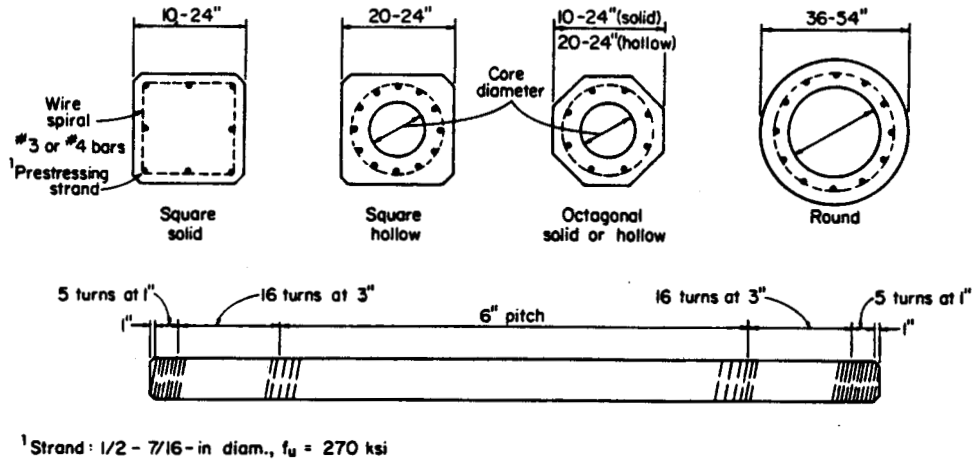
C.2 Typical prestressed concrete pile. (From Bowles, 1982.)
